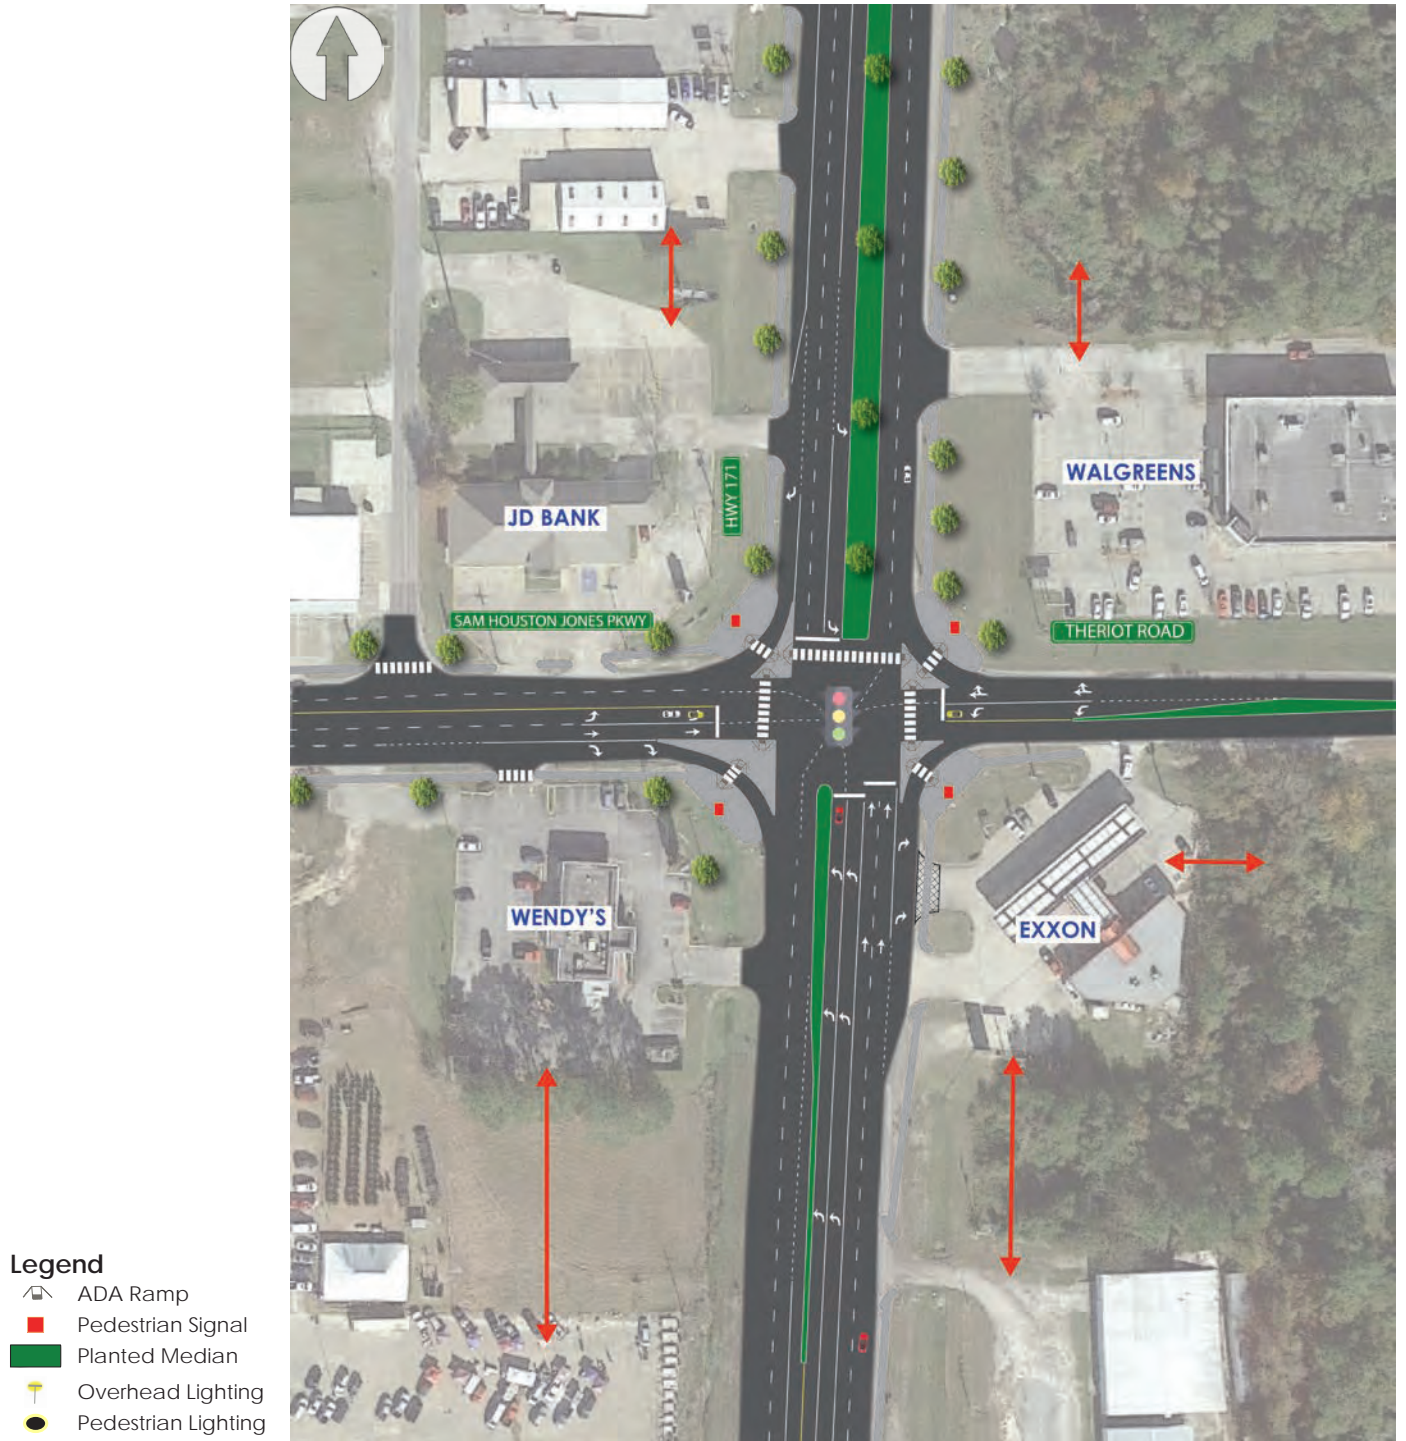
| US 171 and LA 378 Proposed Improvements
